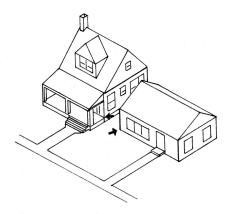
New construction should maintain typical foundation heights. The house on the right is too low.
